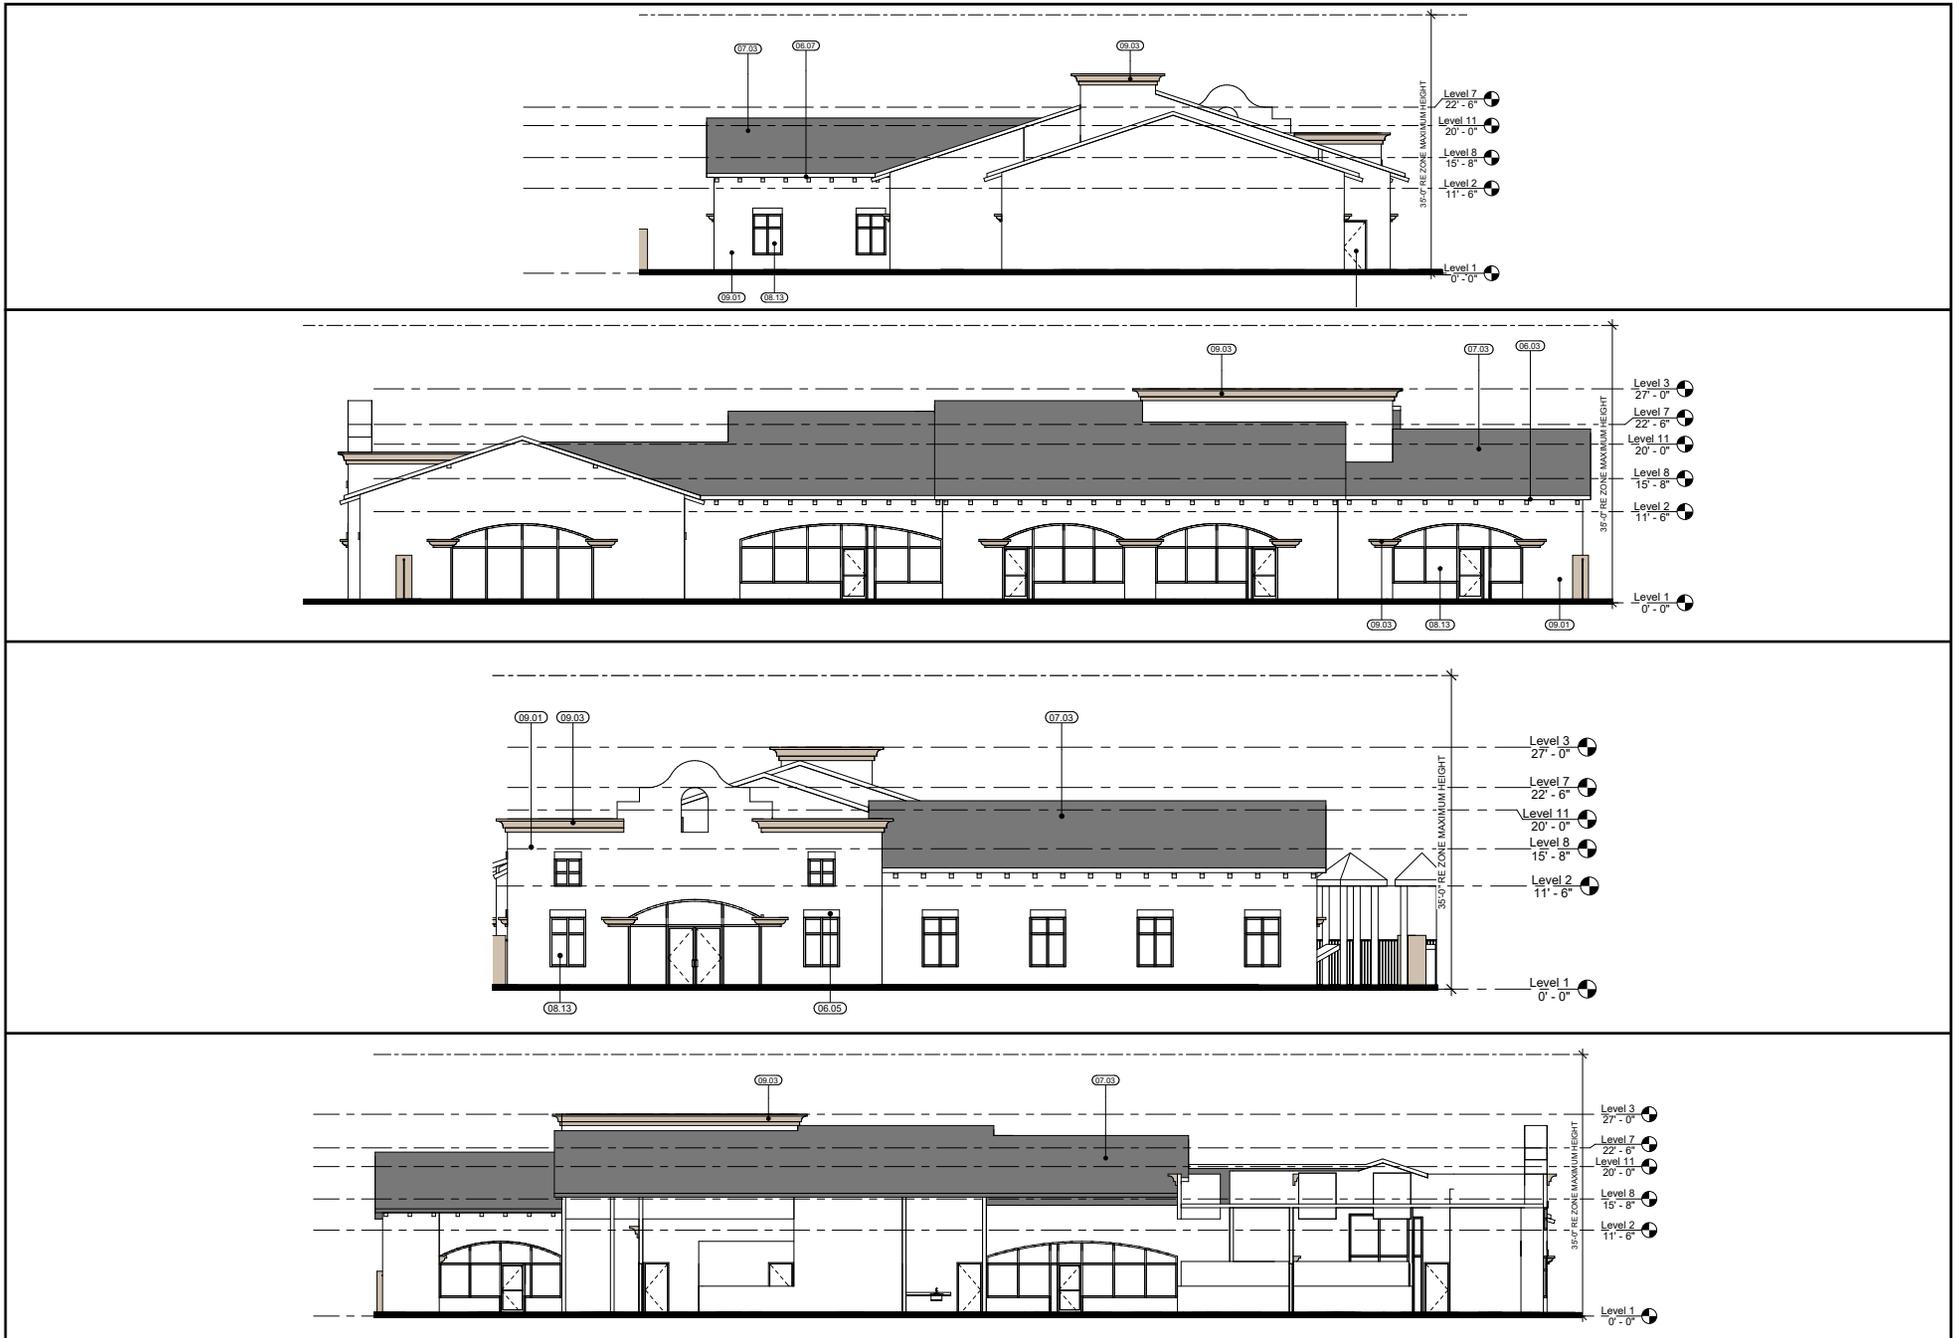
Elevations (Administration/Preschool Building 3)
